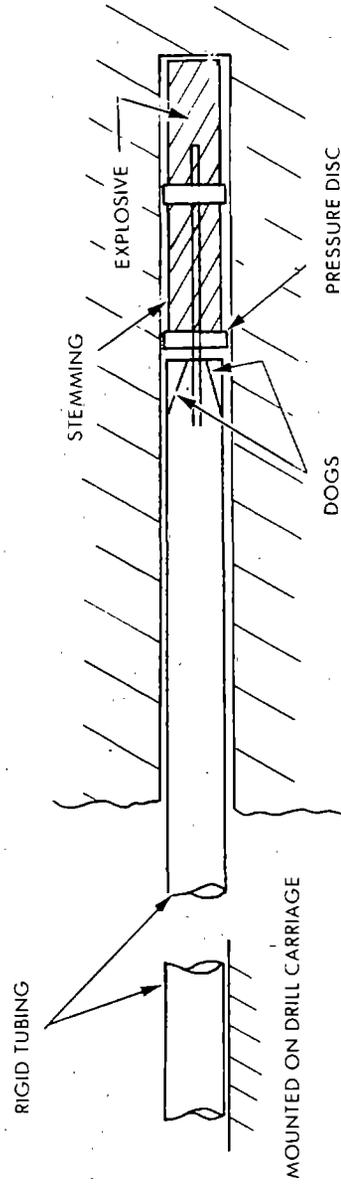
CONCEPT FOR LOADING AND COMPRESSING CHARGE AND STEMMING.
